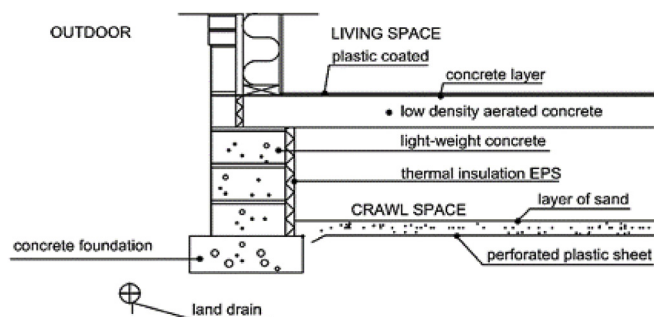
The sectional drawing of the crawl space foundation in the studied building.
